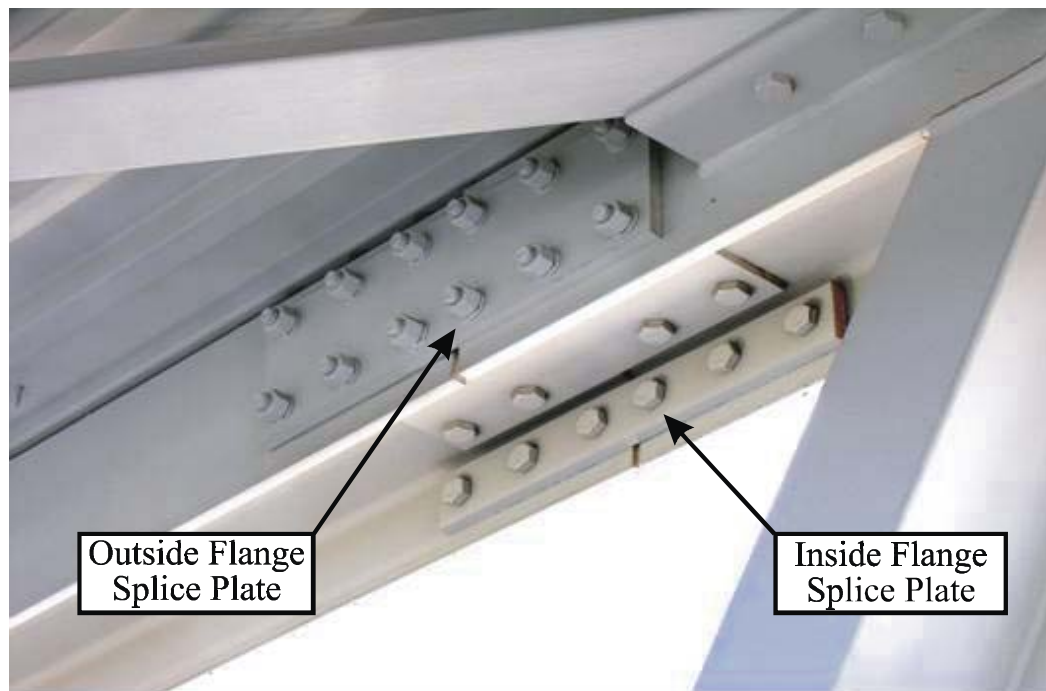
Wide-Flange Connection with Inside and Outside Flange Splice Plates
